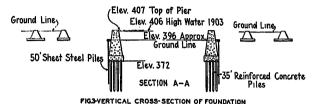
Vertical Cross-Section of Foundation for Intermediate Tower
